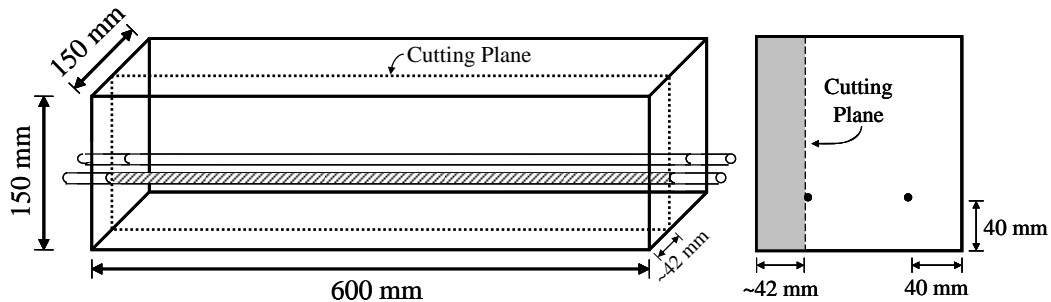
Specimen Geometry with Location of Saw Cutting Indicated.
